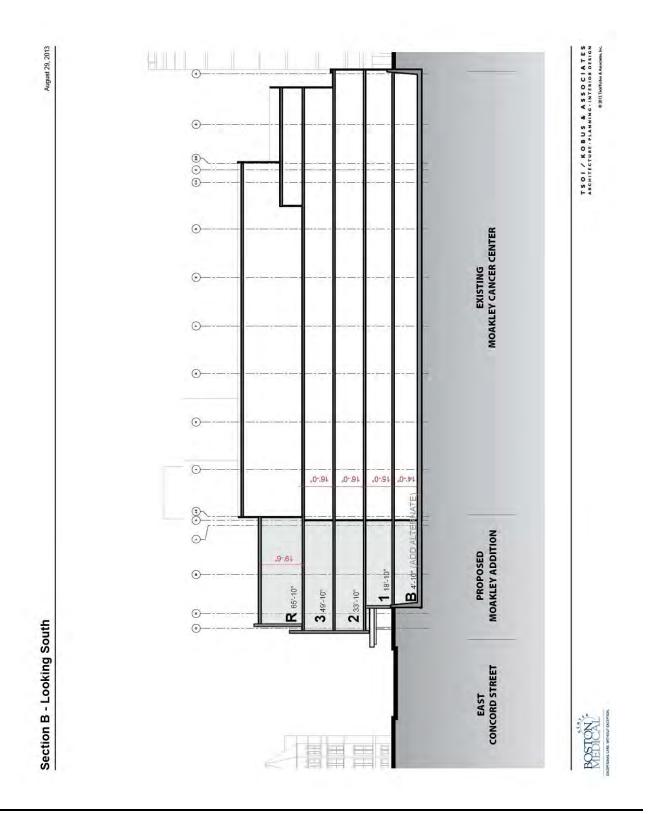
Moakley Cancer Center Addition Building Section Looking South
